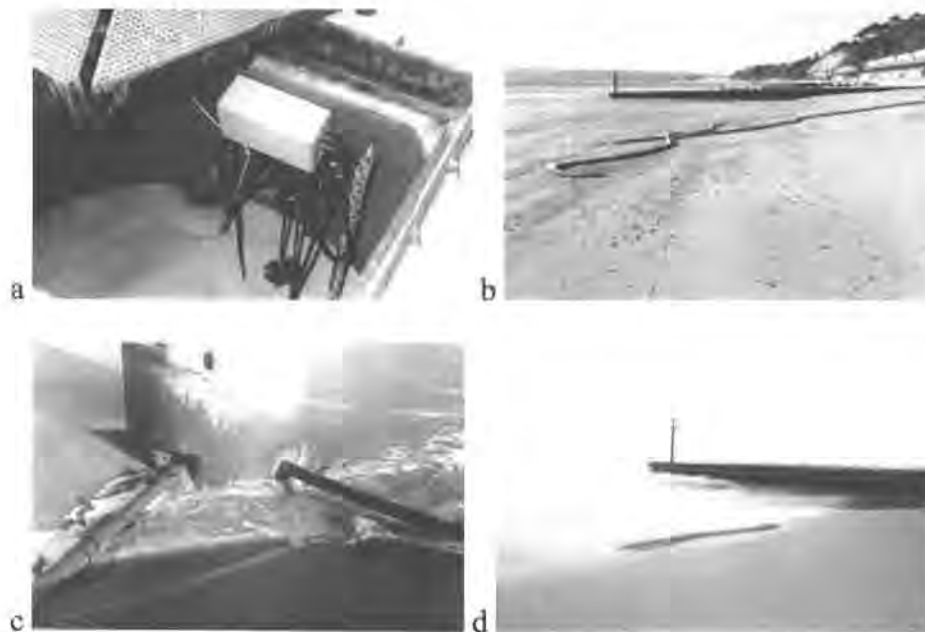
Damage experienced at Branksome Chine, England: (a) sump pump filled with sand; (b) damaged drainage pipes on the beach; (c) low beach levels exposing sump outlet; and (d) uncovered pipe (Mulvaney 2001)
